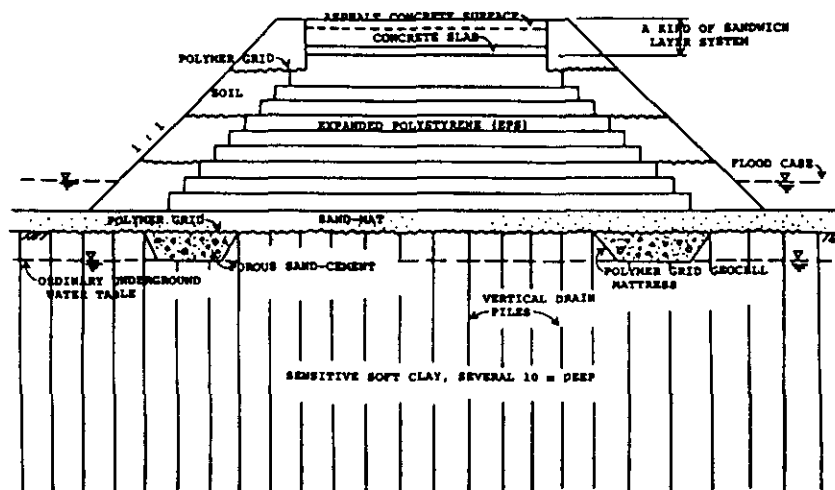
Proposed road section with EPS embankment built on soft grounds, reinforced with polymer grids
